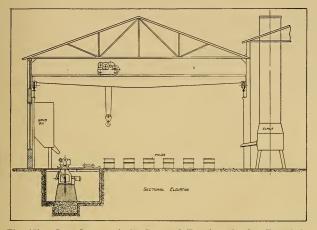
Cross-Section of the Proposed Foundry, showing Tunnel for Machine Foundations.
